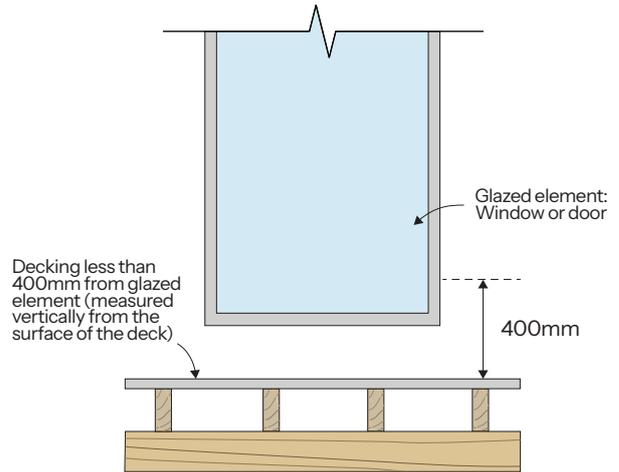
BAL 12.5 and BAL 19 decking limits (elevation view)
